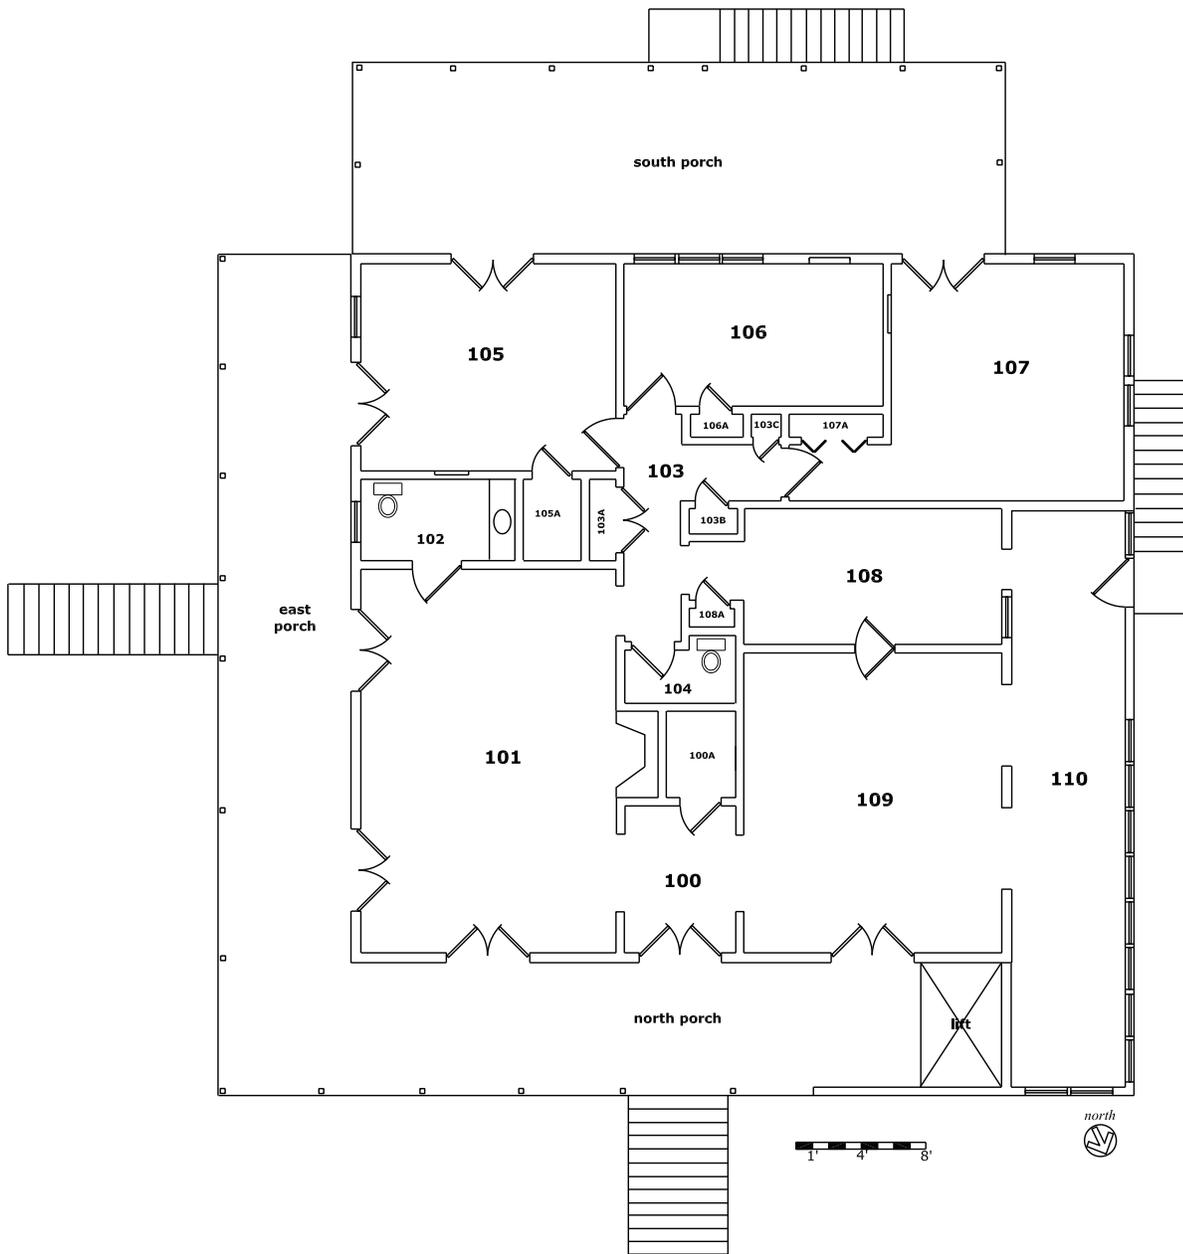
Plan of existing first floor. (T. Jones, NPS-SERO-CR, 2003)
